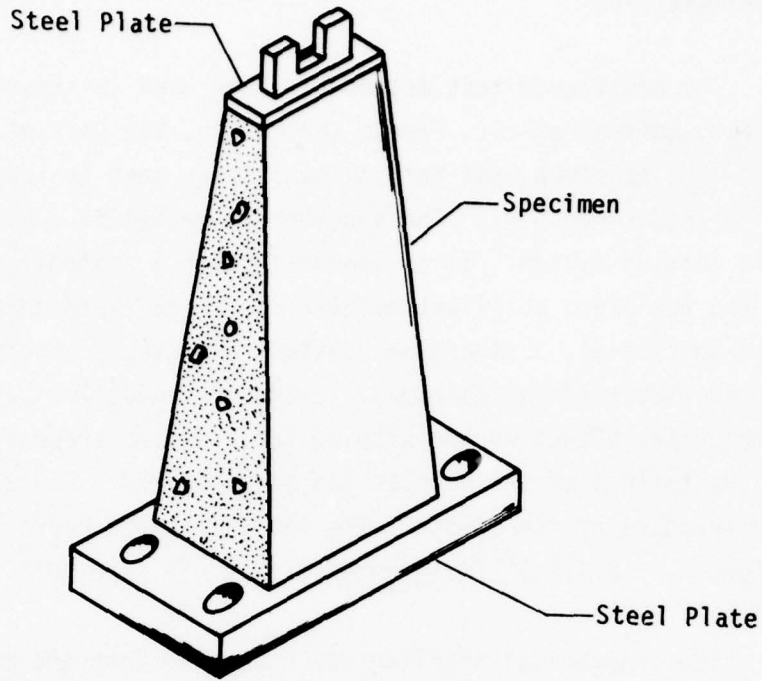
Trapezoidal Specimen (after Coffman et al., Reference 39)
